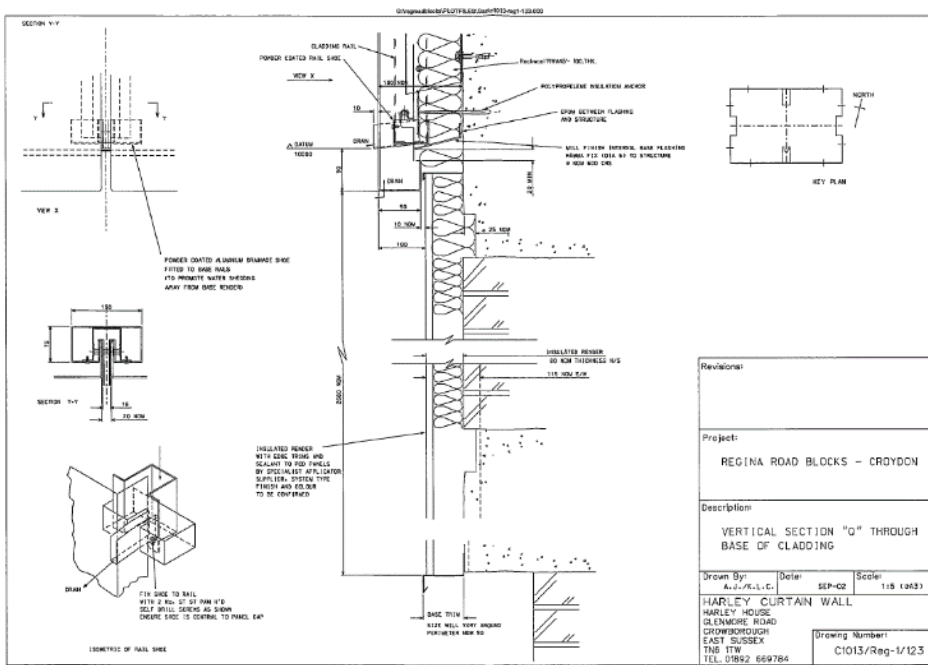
Over cladding record drawings for 'Regina Road Blocks' dated Sept. 2002 showing detail at ground floor
